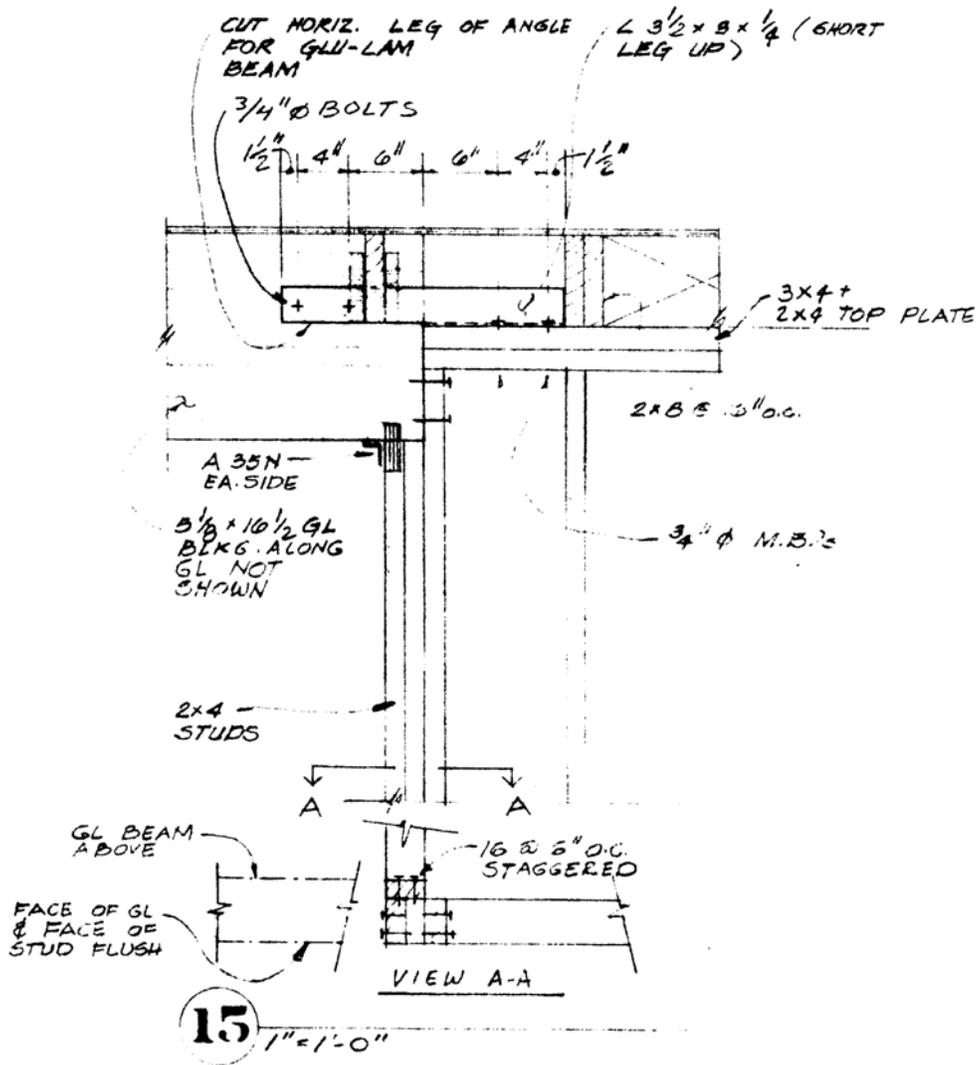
Typical collector connection in Building A showing the attachment of a glulam beam to a wood wall. The strength of the connection is limited by the 3/4" bolts connecting the 3 1/2 x 3 angle to the glulam beam and the wood wall. The D/C ratio is very high 14.0.
